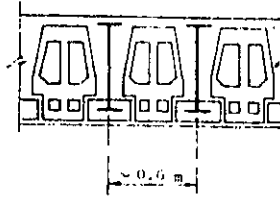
Floor joists with lightweight concrete form pieces.
